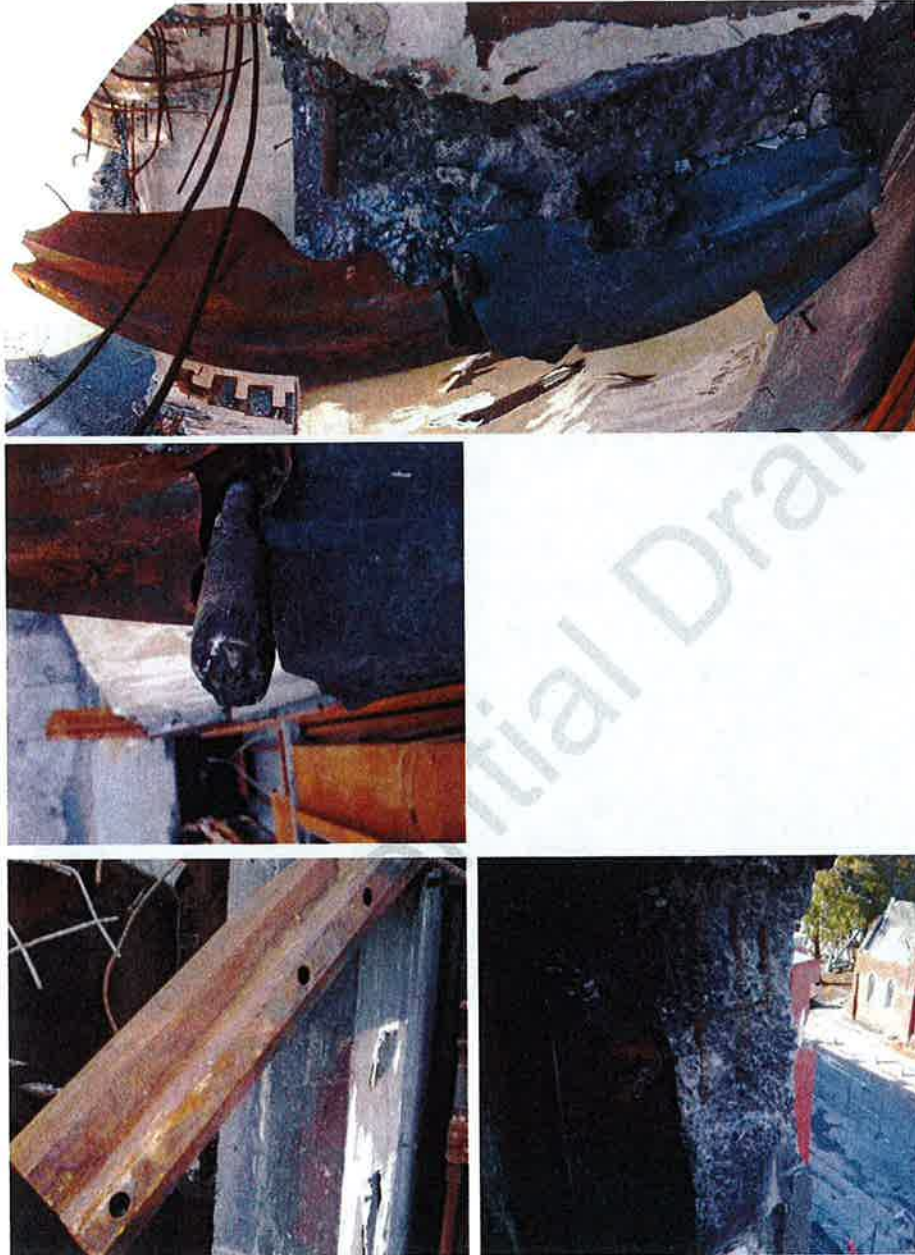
Level 5 Lift Well Wing Walls Grid D and D/E (anti-clockwise from top) (a) the Drag Bar consisted of a 150x150x10 L steel angle with a 51 x 3.2 SHS welded to it; 4-M24 anchors were epoxied into the wall and 6-M20 threaded anchor rods 350 mm long were epoxied into the slab at the profiled metal deck rib. 3-M20 threaded rods remained upright on the Grid D Drag Bar. The 51x3.2 SHS had fractured in bending and tension at the bolt hole adjacent to last bolt into wall and twisted with the slab; This shows that the slab that had been fixed to the Drag Bar had rotated downwards as the column on Line 4 D/E collapsed, (b) Epoxy grout can be seen around the threaded anchor rod that had been in the slab; (c) The drag Bar is bent downwards and holes where 3-M20 threaded anchor rods had been can be seen; d) On Wall D/E a 150x75x10 L steel Drag Bar was still fixed into the wall D/E with 5-M24 threaded rod anchors. The end of the Drag Bar had been gas cut during deconstruction.
